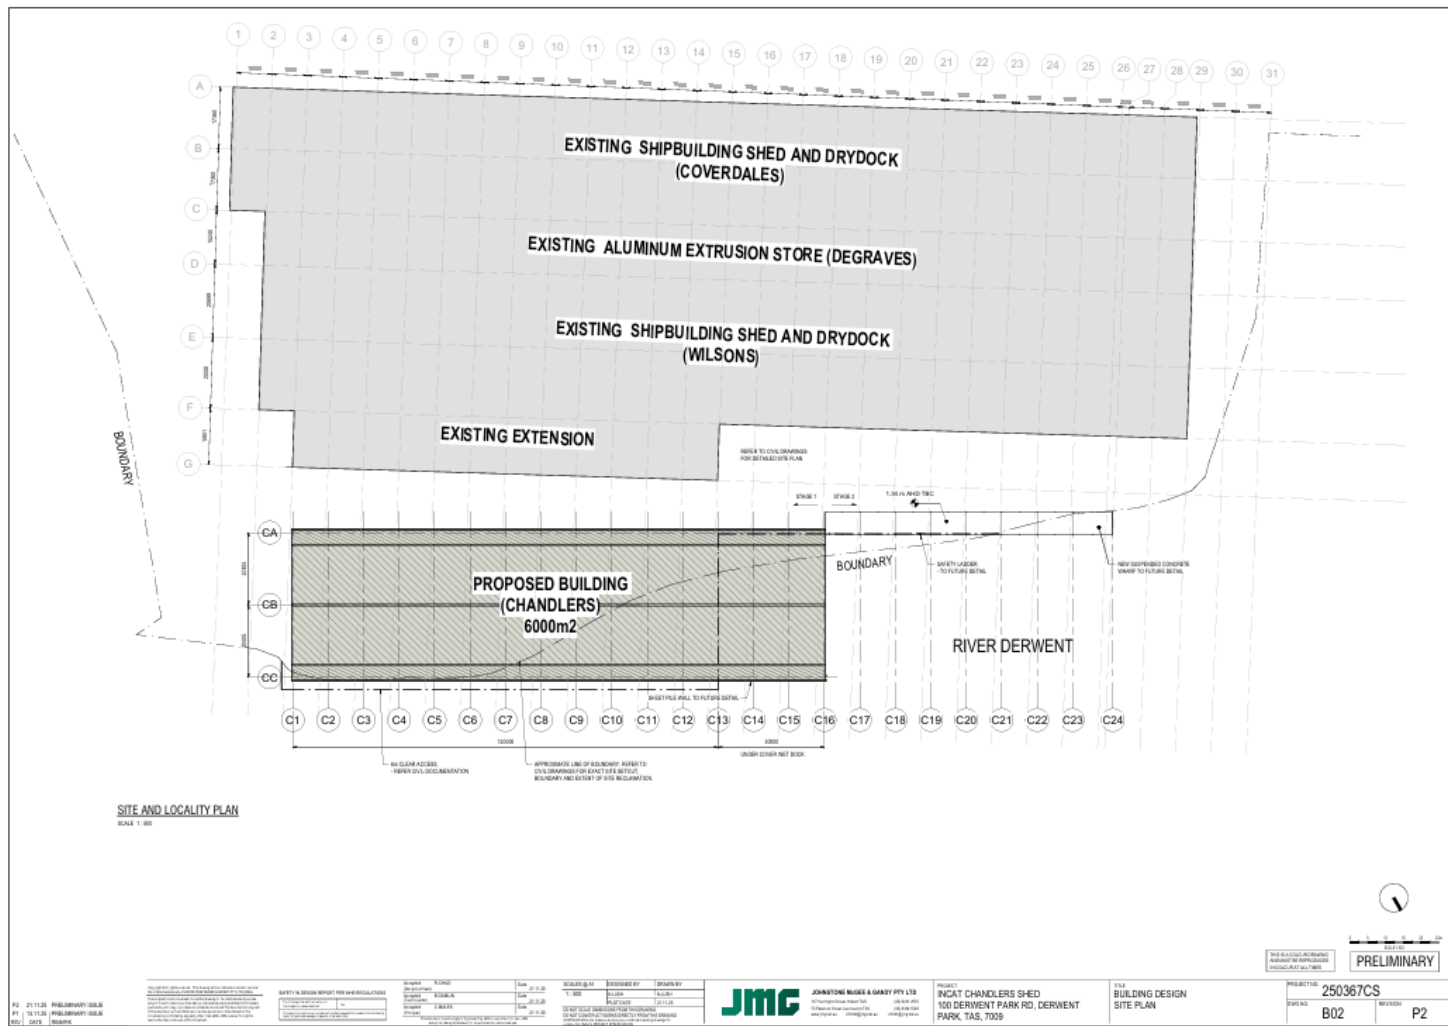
Screenshot of Building Design Site Plan (Site and Locality Plan) from JMG, displaying position of Proposed Building and adjacent walkway (Provided by D. Gray, pers. comms. 10 January 2026).
